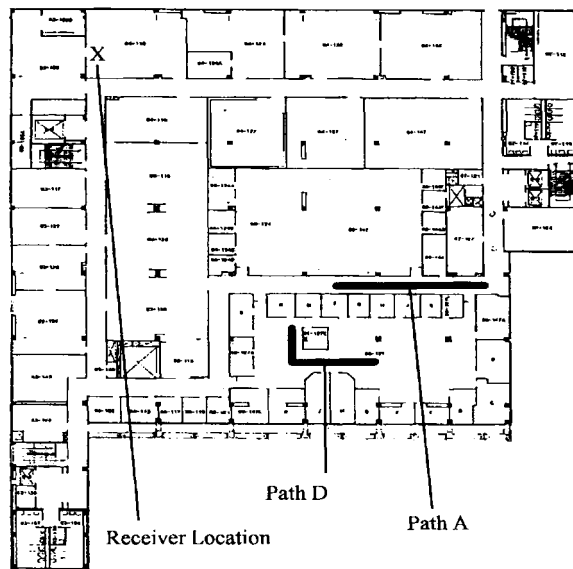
Floor layout of the sixth floor of the Engineering IV building on the UCLA campus, with the test paths A, D, and the receiver location indicated. The approximate floor dimensions are 67 m \times 60 m.
